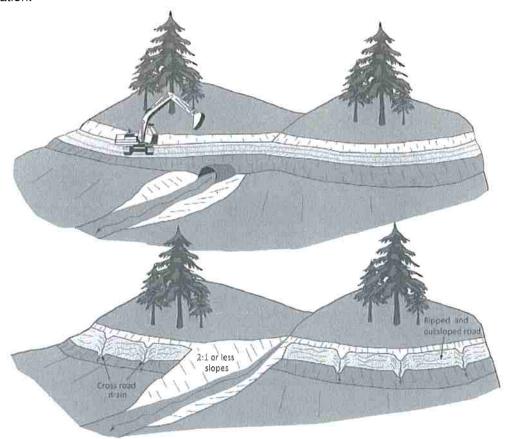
On roads that are to be closed (decommissioned), all stream crossing culverts and fills should be removed. Stream crossing excavations are best performed using an excavator. The original channel should be excavated and exhumed down to the former streambed, with a channel width equal or greater than the natural channel above and below the crossing. Sideslopes should be laid back to a stable angle, typically a 2:1 (50%) gradient, or less. Spoil can be endhauled off-site or stored on the road bench adjacent the crossing, provided it is placed and stabilized where it will not erode or fail and enter the stream.
